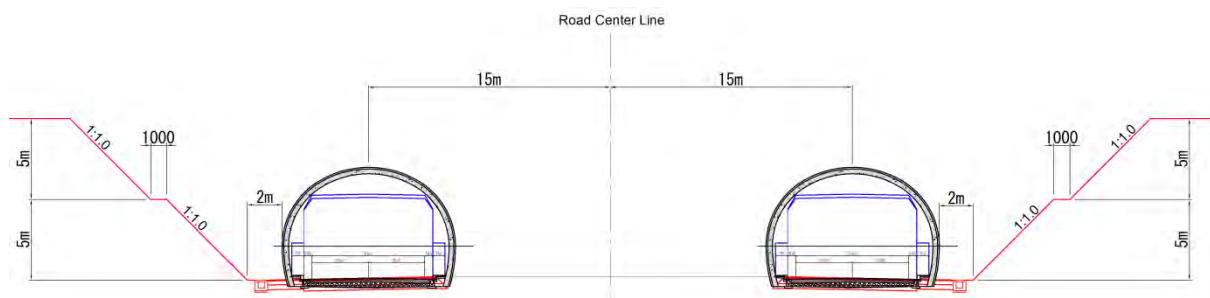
Typical Cross-Section of Tunnel Portal
